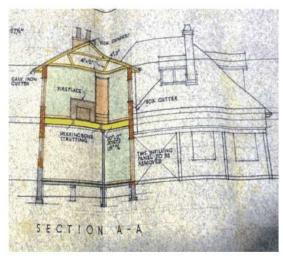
Section drawing, showing proposed works, December 1952. Source: Woollahra Council.
